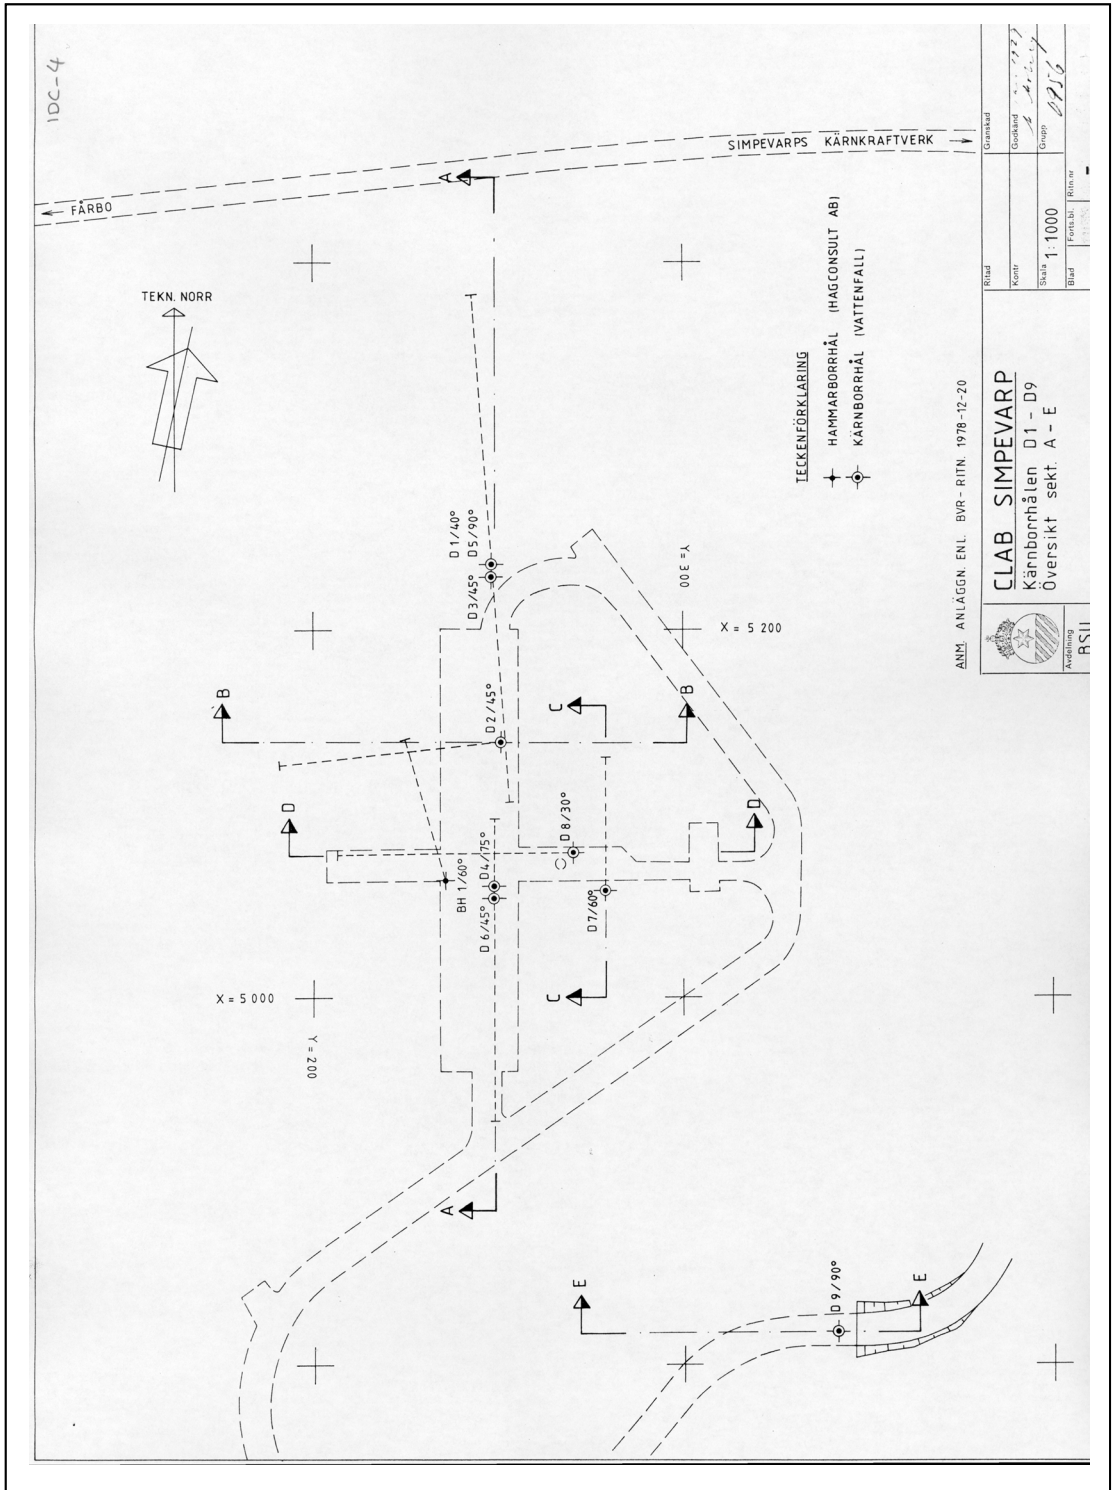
Clab plan view showing locations for rotary drillholes D1 to D9
